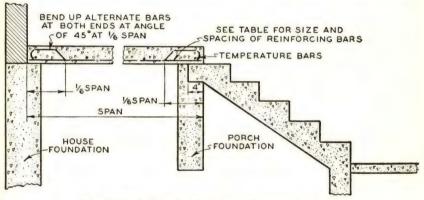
Cross Section of Reinforced Concrete Porch Floor
